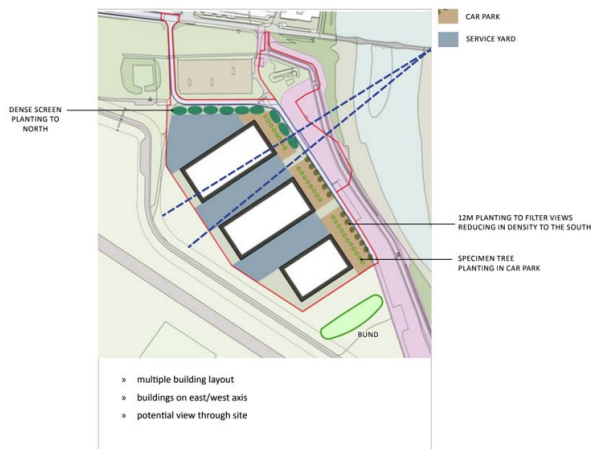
Diagram - Multiple Building Layout : Three Buildings
